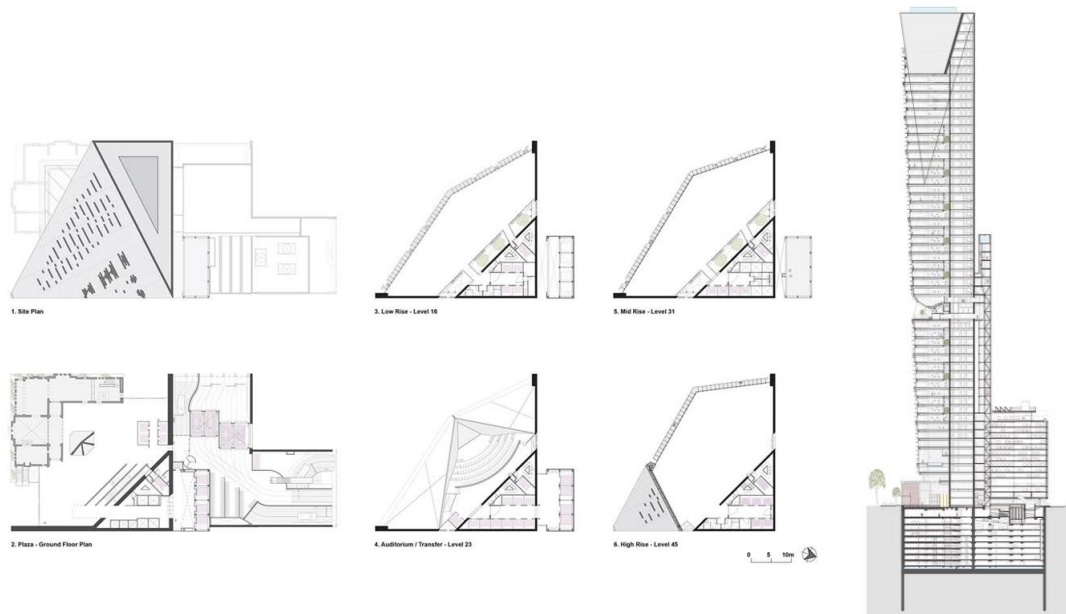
Plans 1 and 2 levels, section of the Torre Reforma
